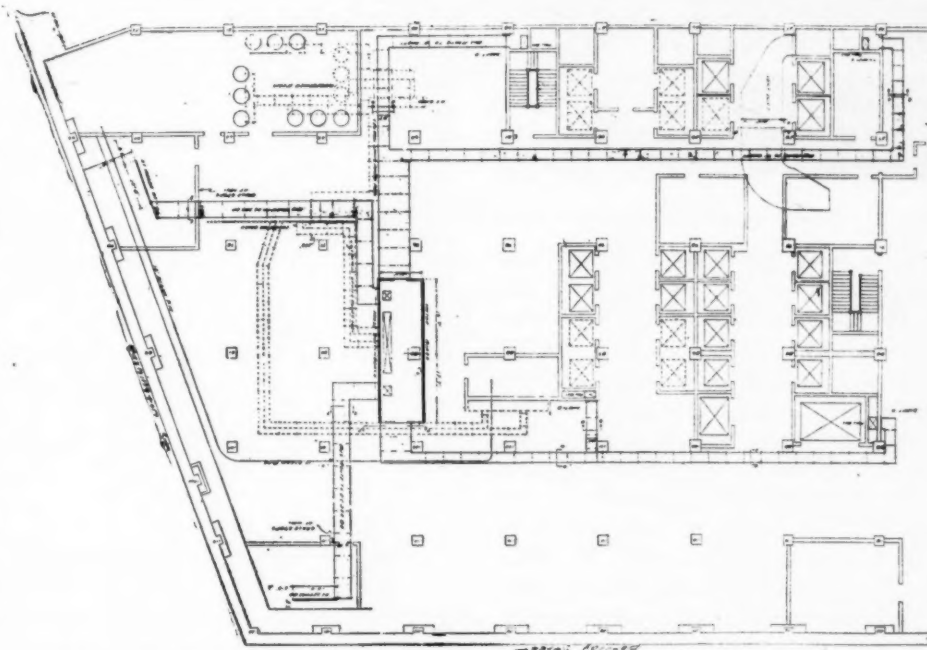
Bus Bar Routes From Service Entrance to House Switchboard and Risers
